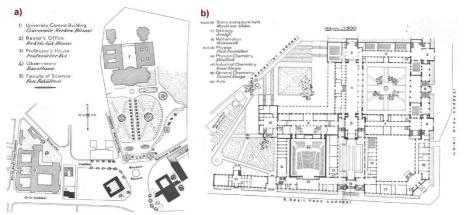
The site plan and floor plan of the building used for the symposium held at Istanbul University in 1952, a) site plan, b) floor plan (Günergun & Kadıoğlu, 2006).
